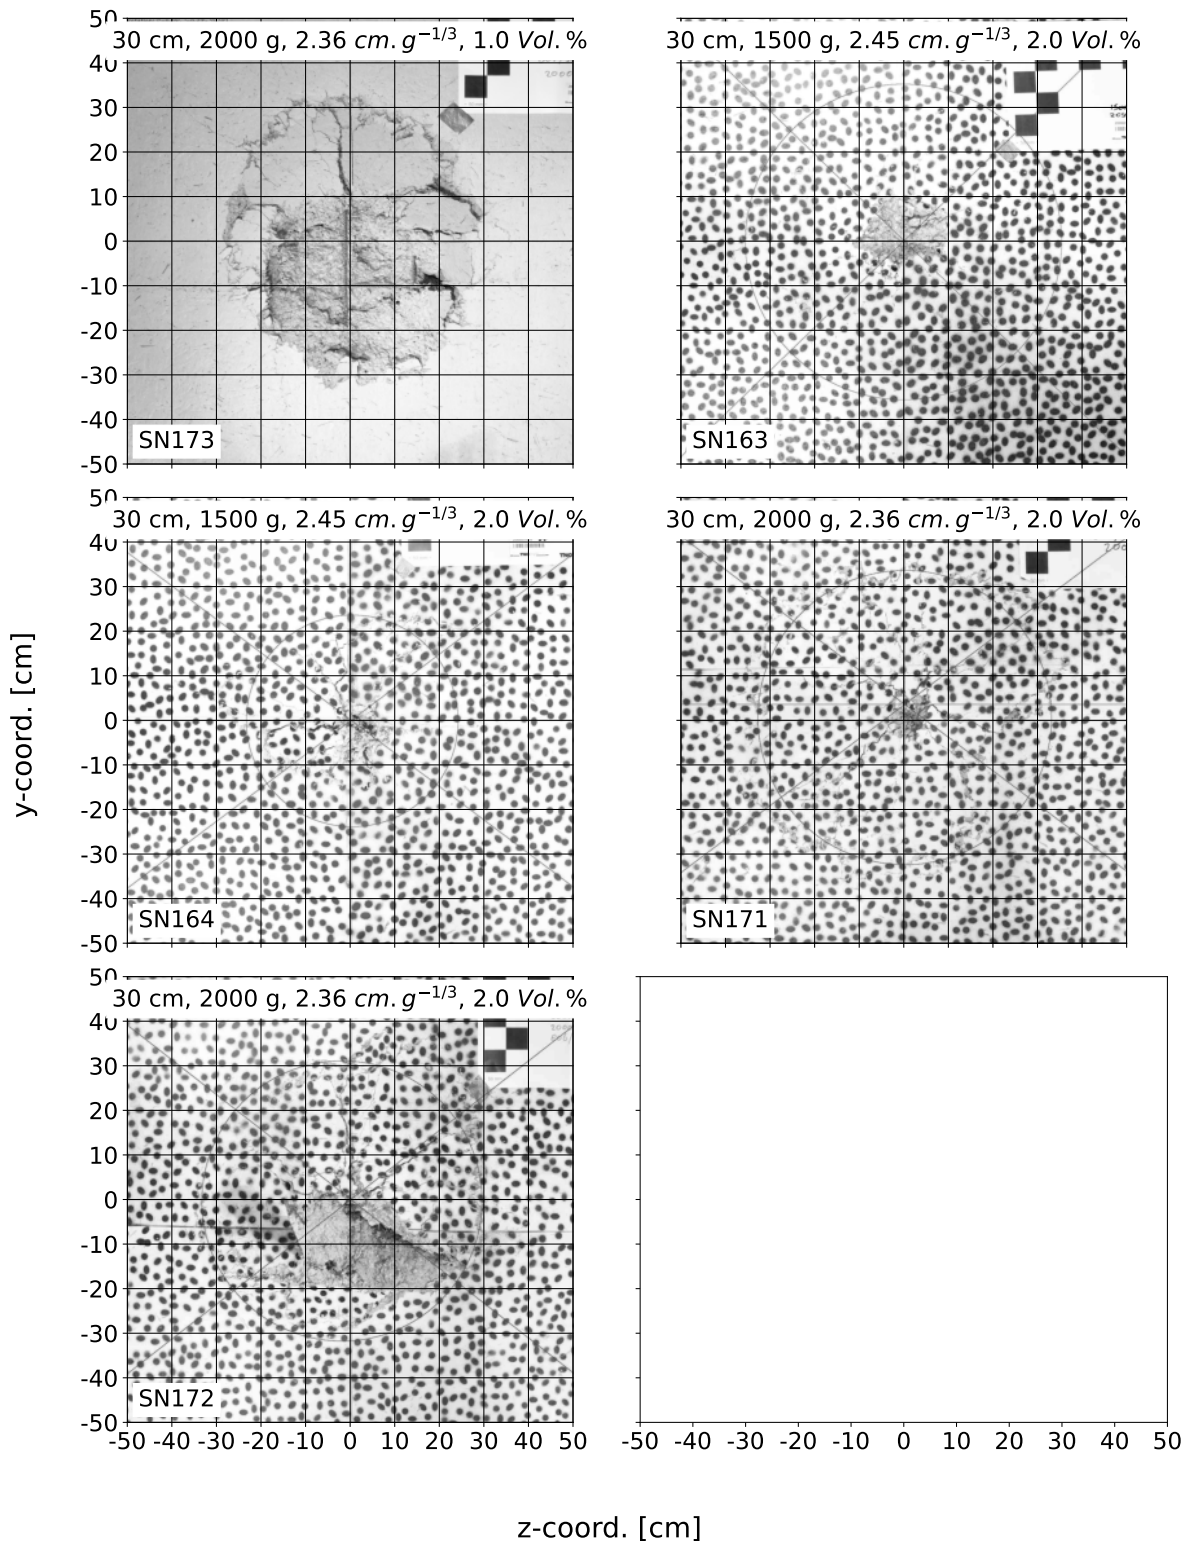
Spalling crater (with steel fibers, part 2)
